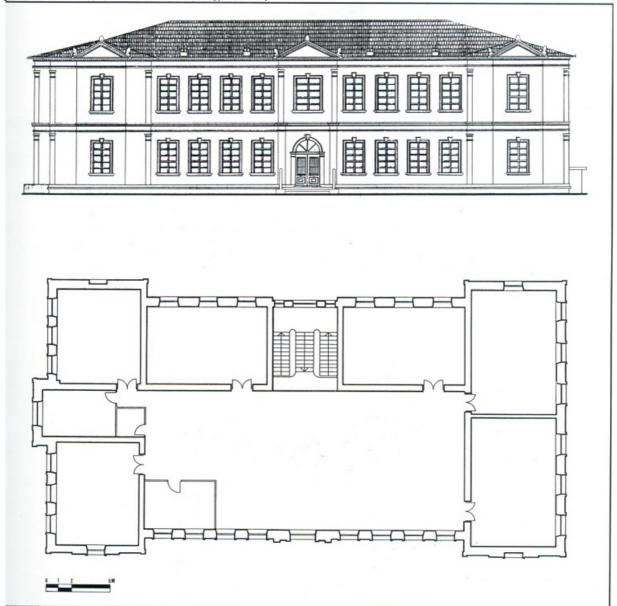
Plan and Elevation of the Ractivan schoolbuilding
